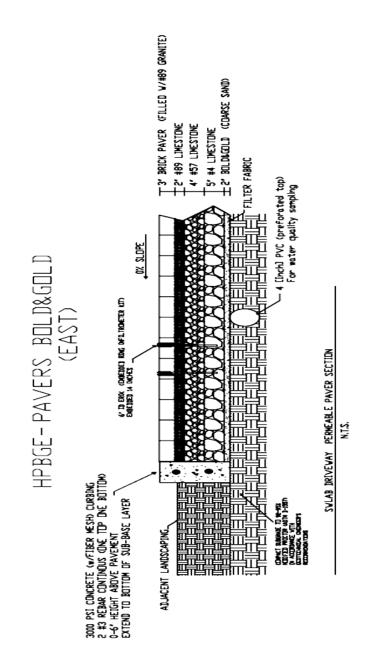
Cross-sectional view of Hanson Pavers Bold & Gold (HPBG)
